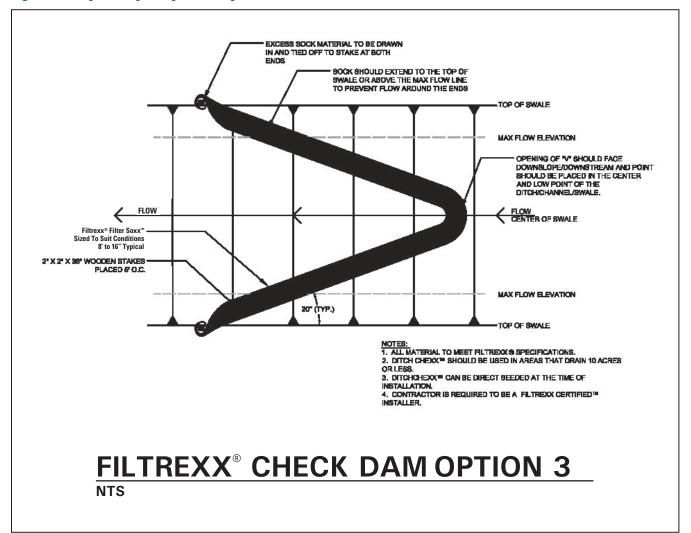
Engineering Design Drawing for Inverted Check Damused for Storm Flow.
